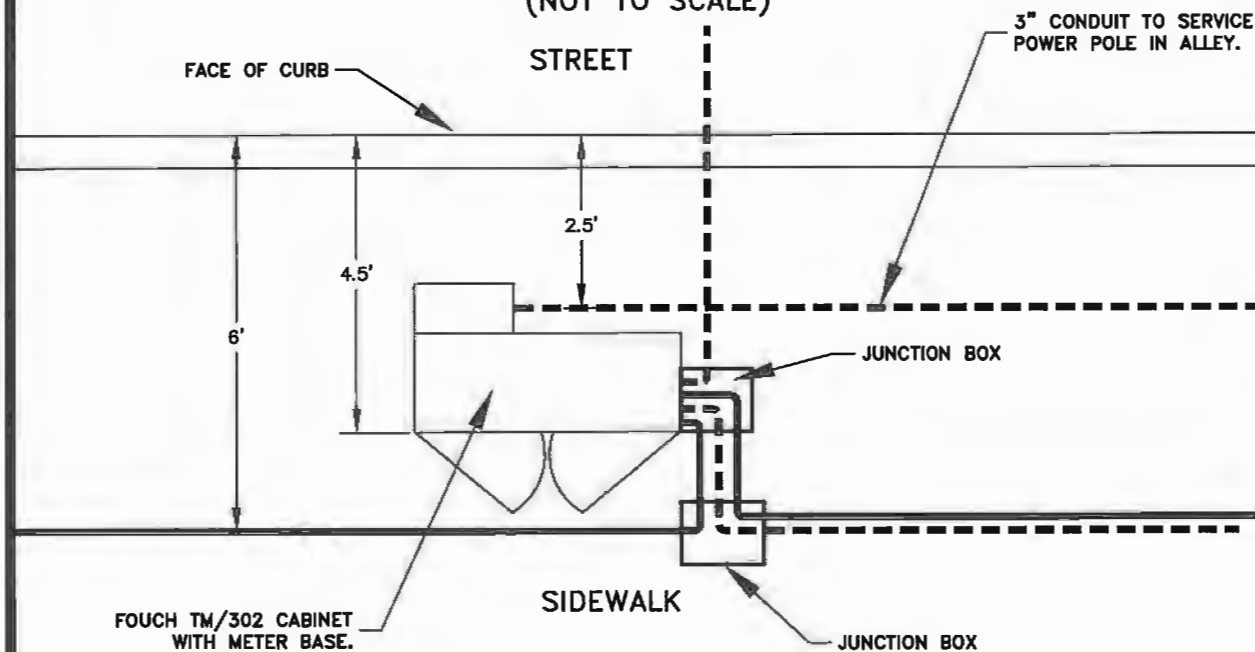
DETAIL E: TYPICAL ELECTRICAL INFRASTRUCTURE INSTALLATION
